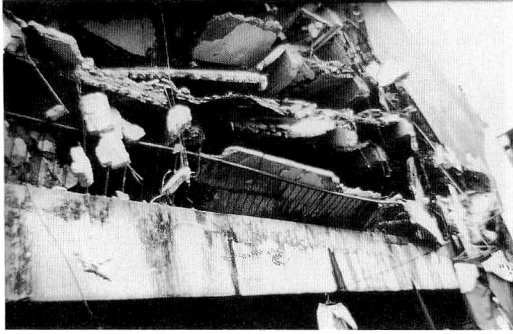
(c) BAGUIO HILLTOP HOTEL (west side view)
